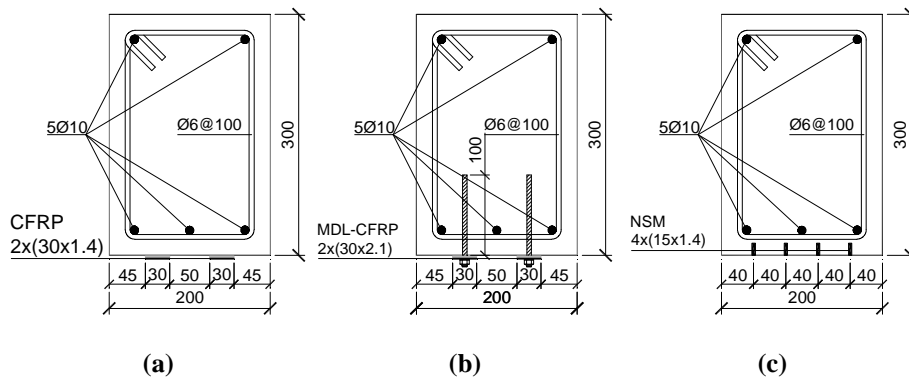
Cross section of the strengthened beams: (a) EBR; (b) MF-EBR; (c) NSM. Note: all dimensions are in millimetres.
